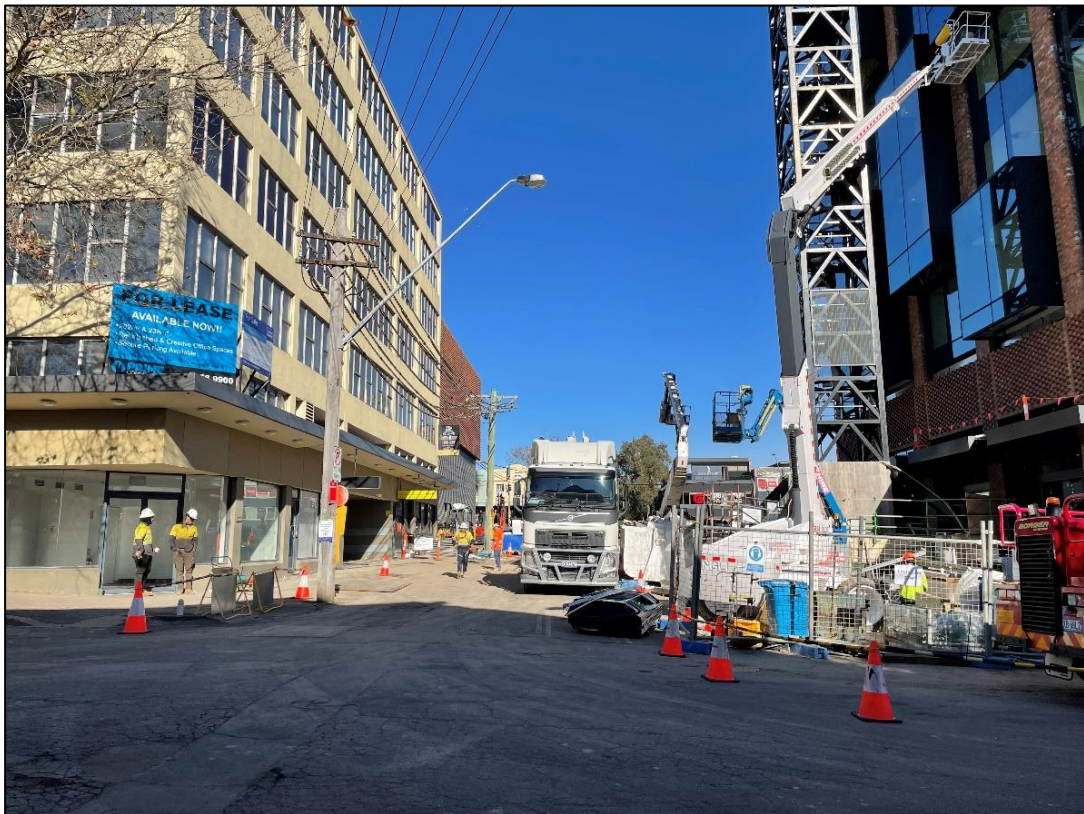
View from the corner of Hume Street and Clarke Street looking West to Site B (July 2024)
